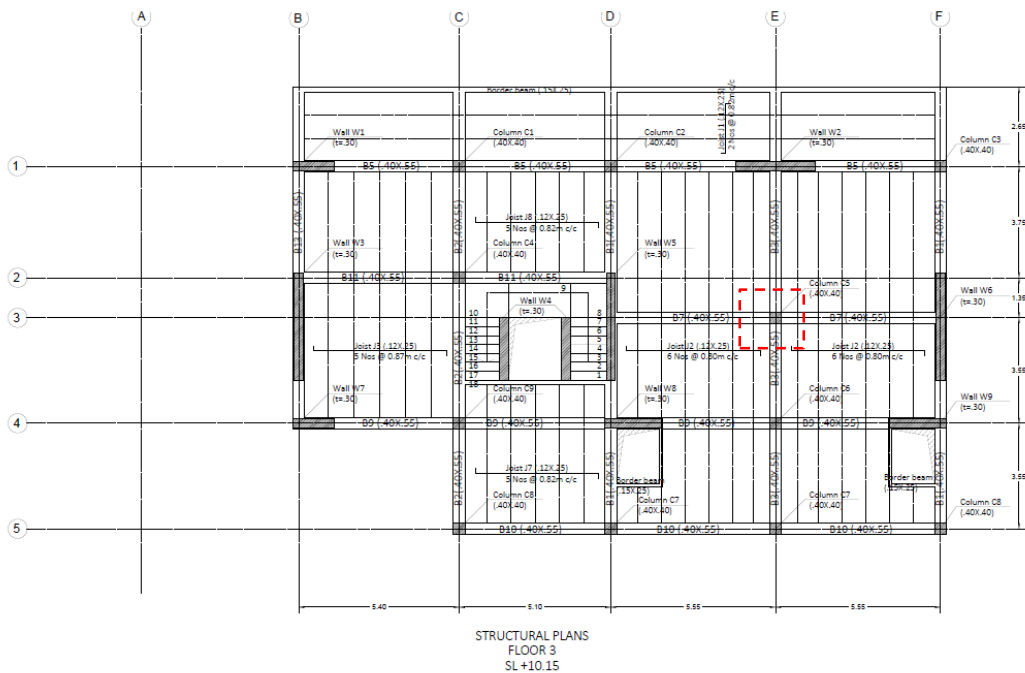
Localization of the column C-5 in the structural plan of third floor.
